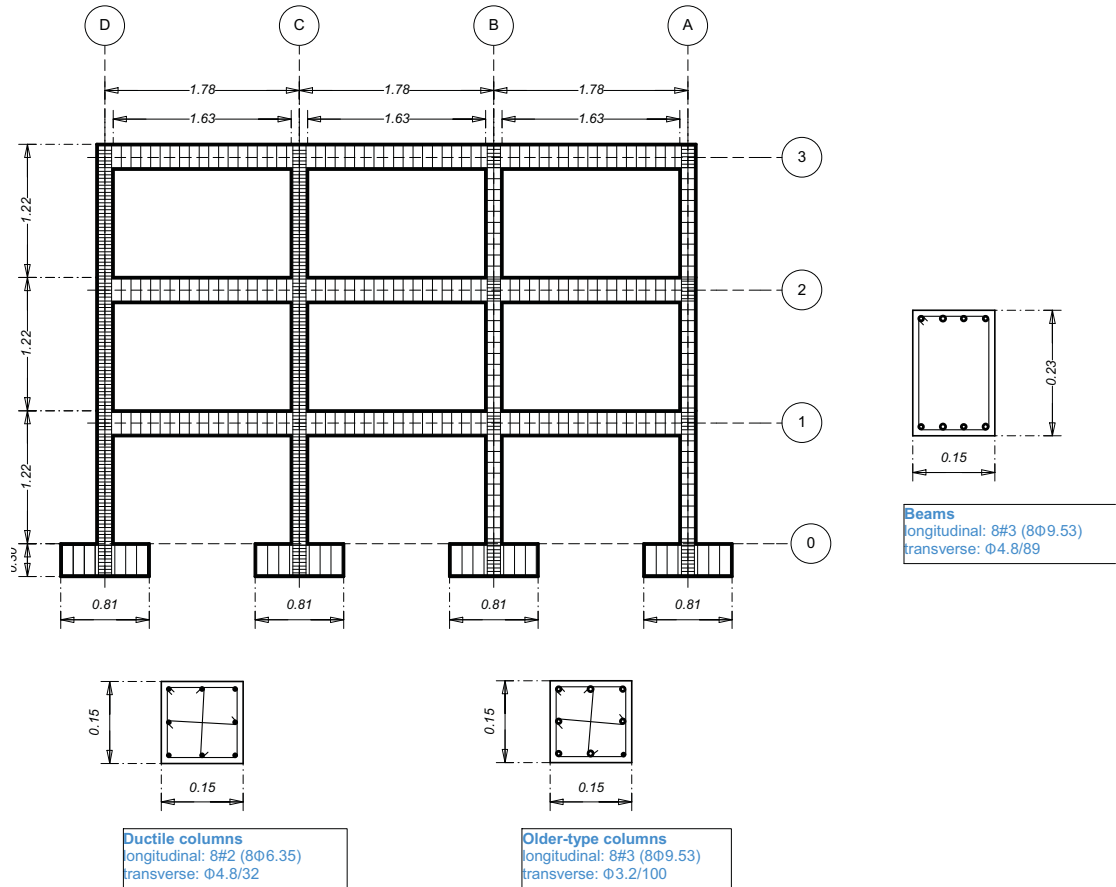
3-storey, 3-bay frame dimensions and reinforcing details
